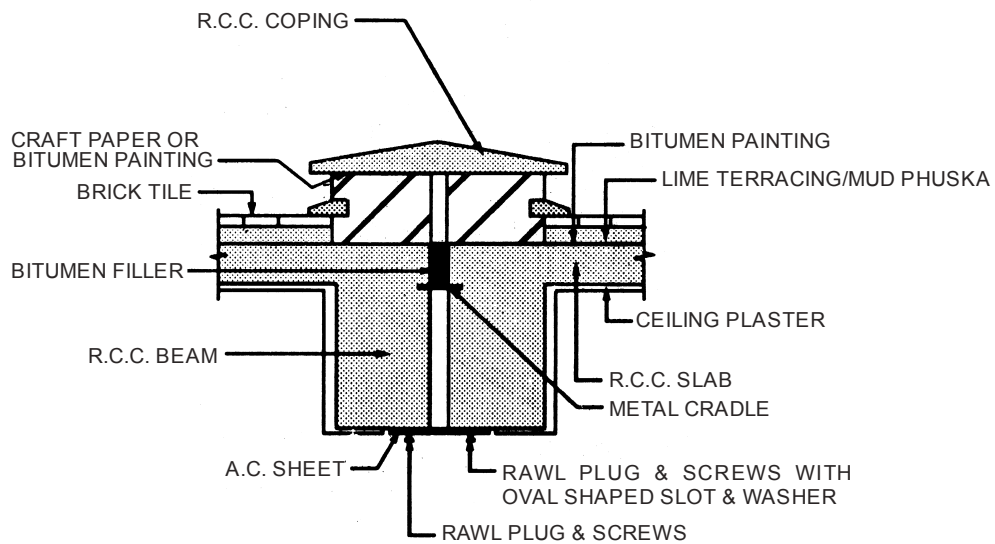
Details of Raised Type Expansion Joint at Roof
